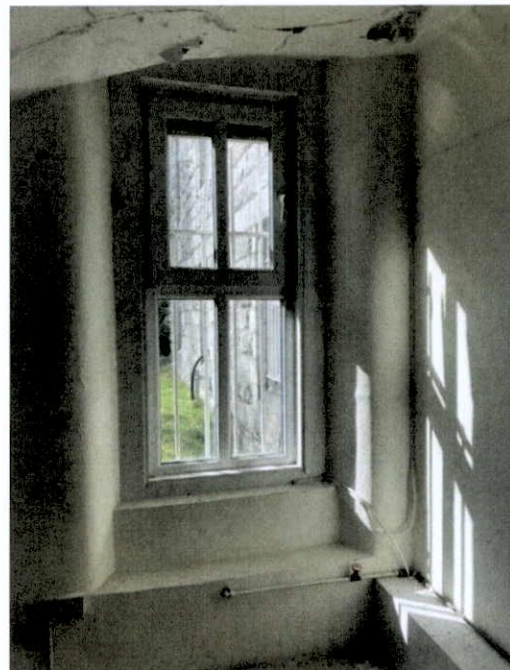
Contemporary uPVC window on lower ground floor. Beneath main entrance. Note deterioration of ceiling fabric indicative of water ingress through exterior steps.
